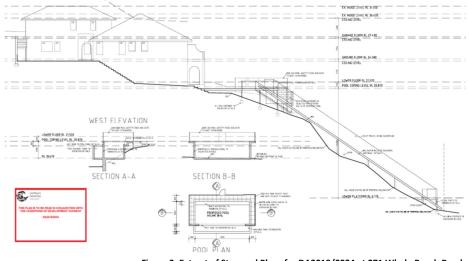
Extract of Stamped Plans for DA2019/0534 at 271 Whale Beach Road Source: Northern Beaches Council DA Tracking
